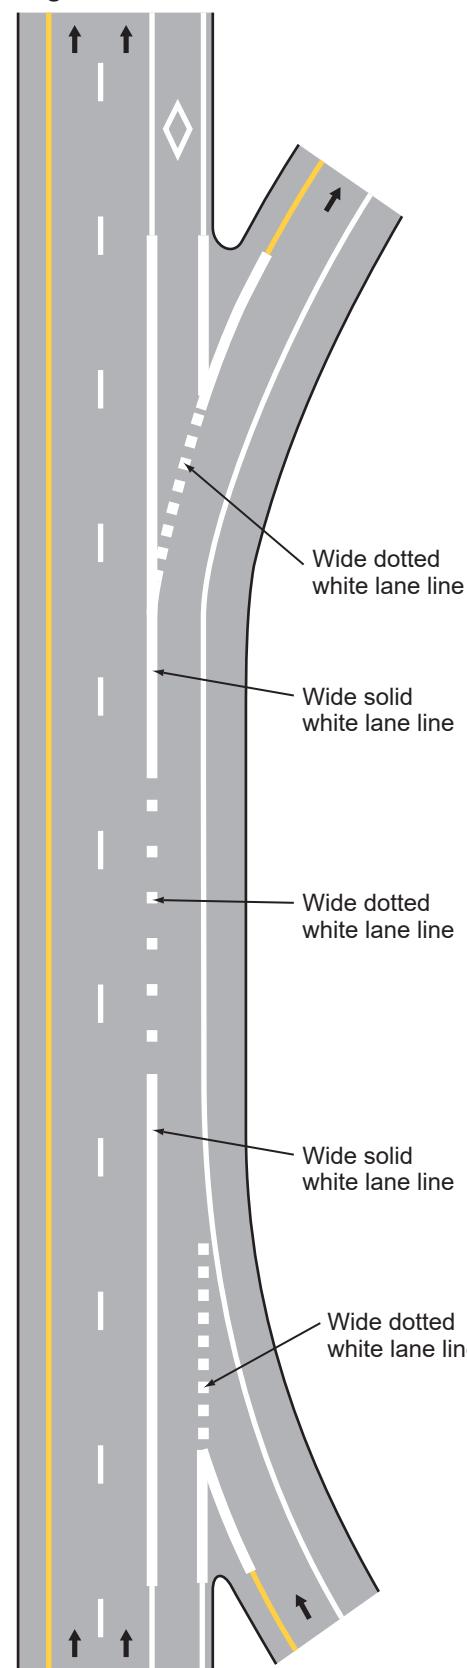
E-5. Markings for Part-Time Travel on Shoulder and Application of Pavement Word Markings (Sheet 3 of 3)
